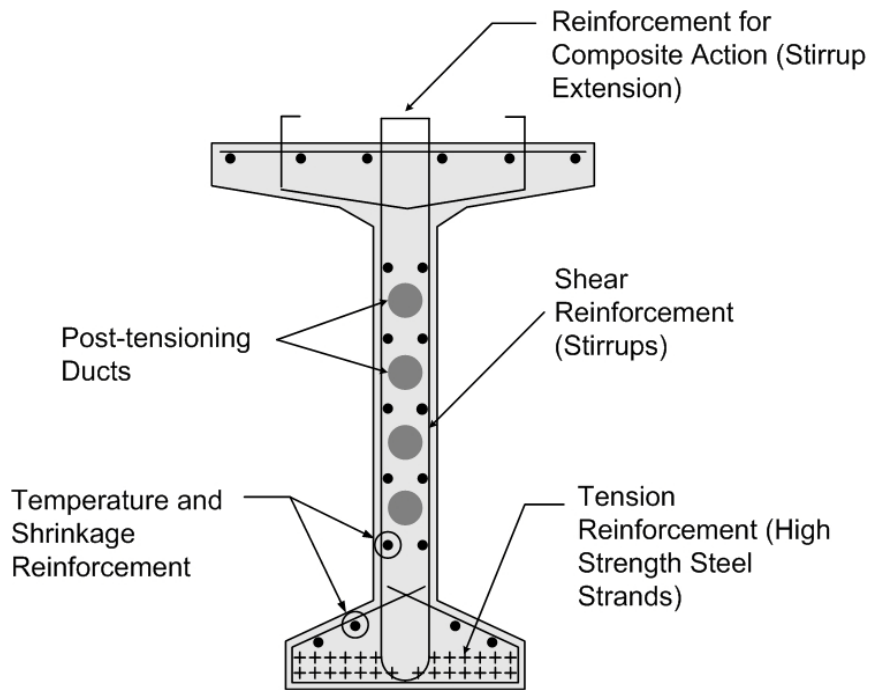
Prestressed Bulb-Tee Beam Reinforcement
